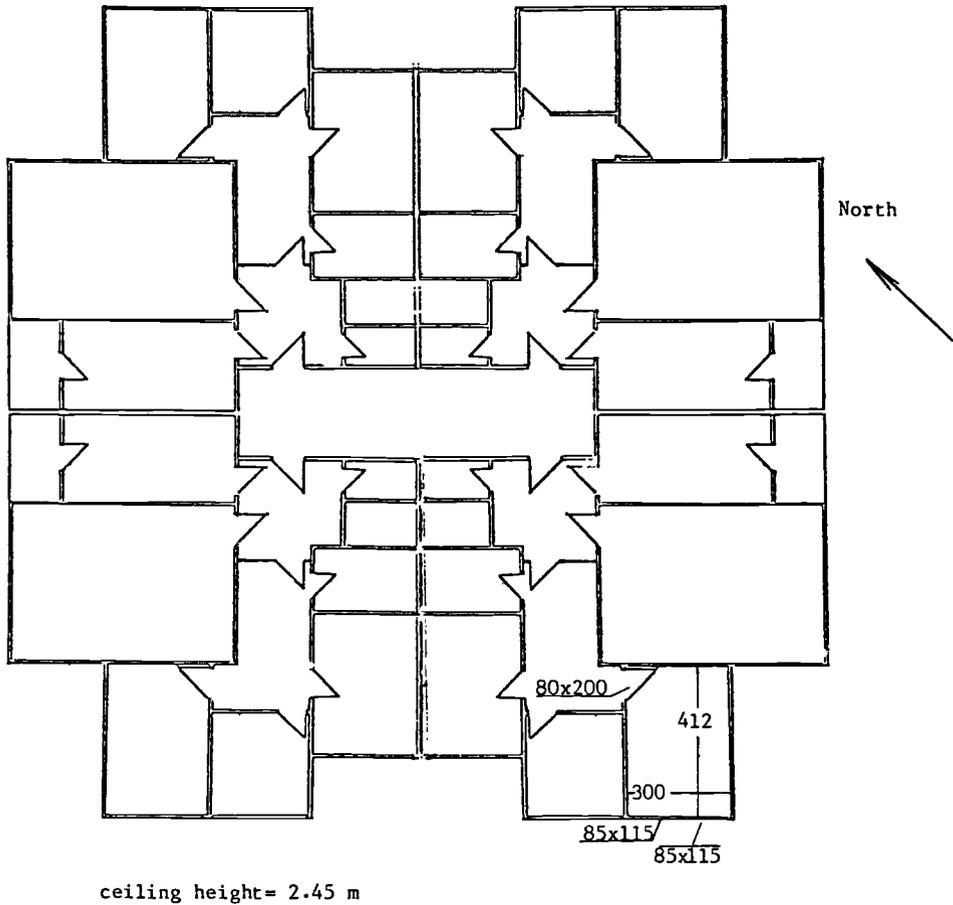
Floor plan of the ten-story apartment building constructed by tunnel formwork technology in the second site.
